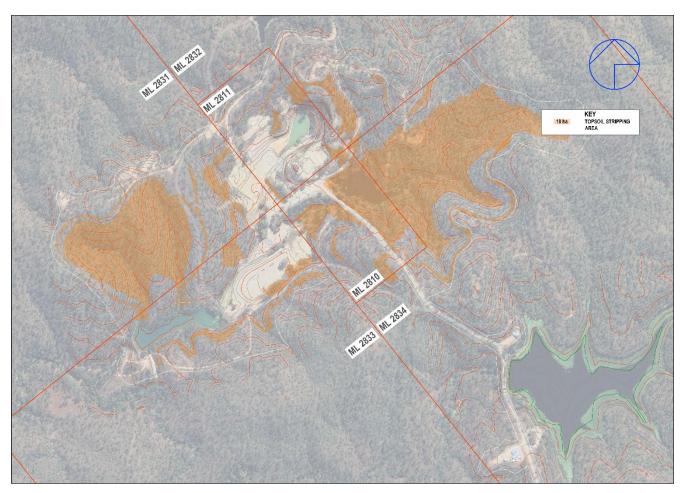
Topsoil Stripping Area Layout (See also Dwg. J022.200.00-SKE-010.01-Topsoil_Stripping_Area_Layout)
